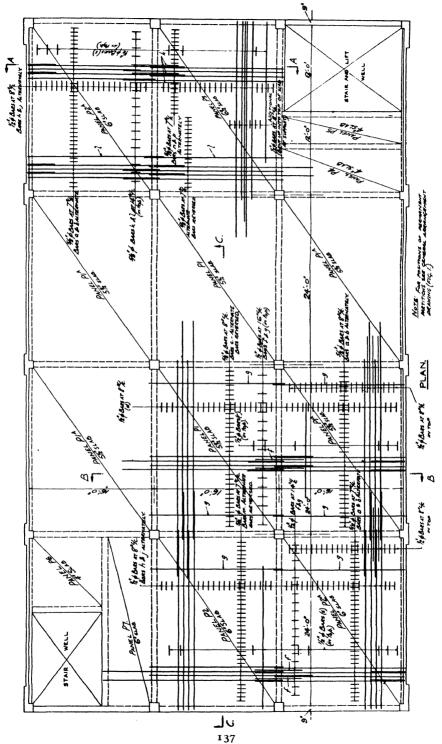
PLAN OF SLAB SPANNING IN TWO DIRECTIONS.
